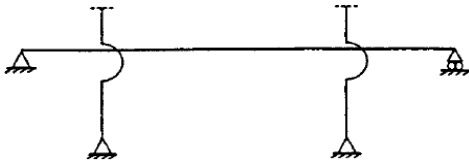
Unsupported girder in Nescio Bridge, Amsterdam
